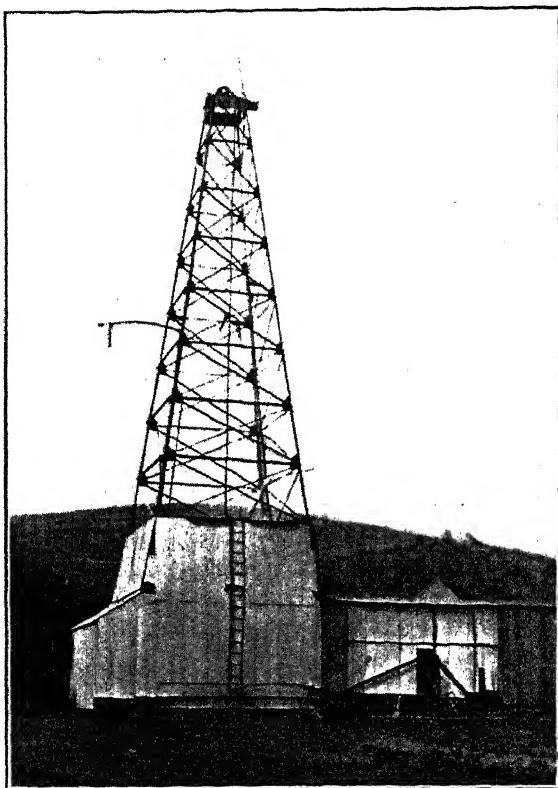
80-FT. STEEL DRILLING RIG, 1908. CARNEGIE NATURAL GAS CO., EXPORT, PA.
